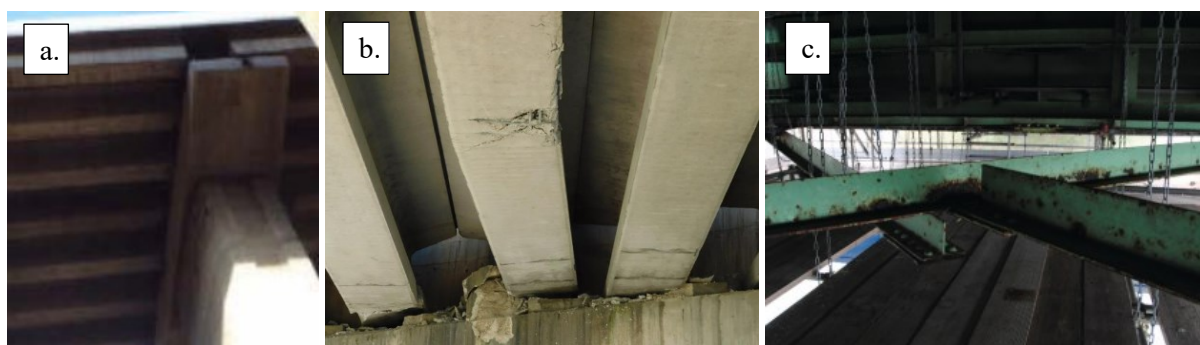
Superstructure damage: a. excessive movement [18]; b. heavy damage to main girder due to impact in the seismic block and horizontal bending [30]; c. heavy damage – failure of horizontal bracing [31]
